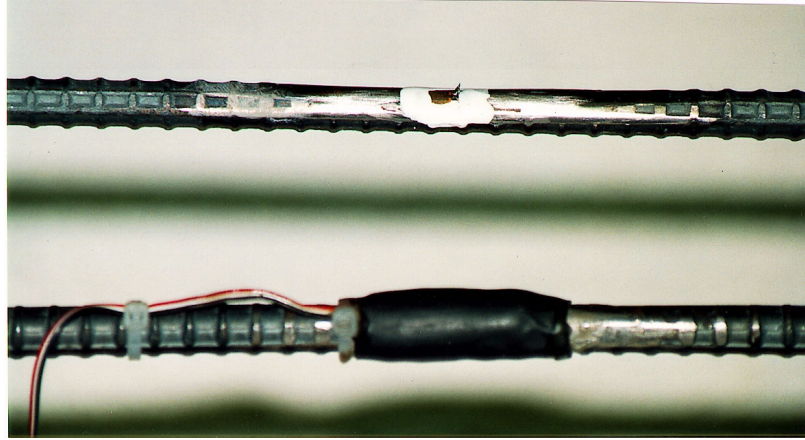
Electrical resistance gages epoxy bonded to steel reinforcement
